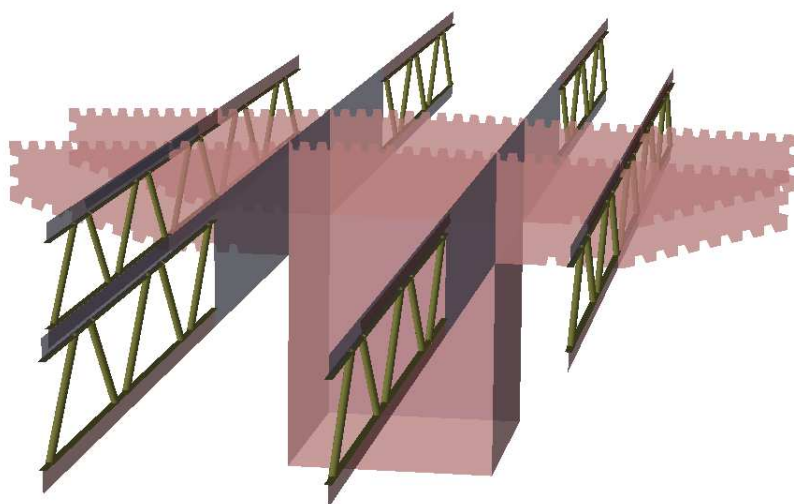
Transverse/longitudinal bulkheads and longitudinal trusses above columns
